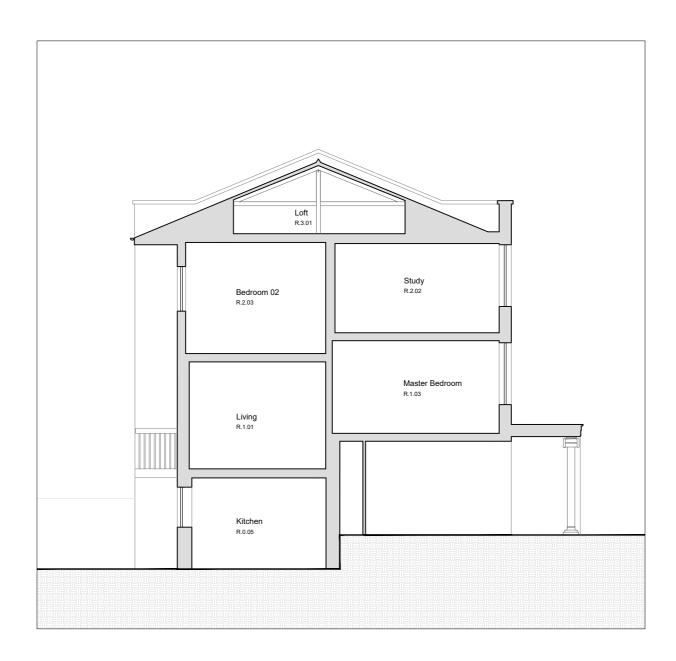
Existing Section AA- Scale 1:100 @ A3
